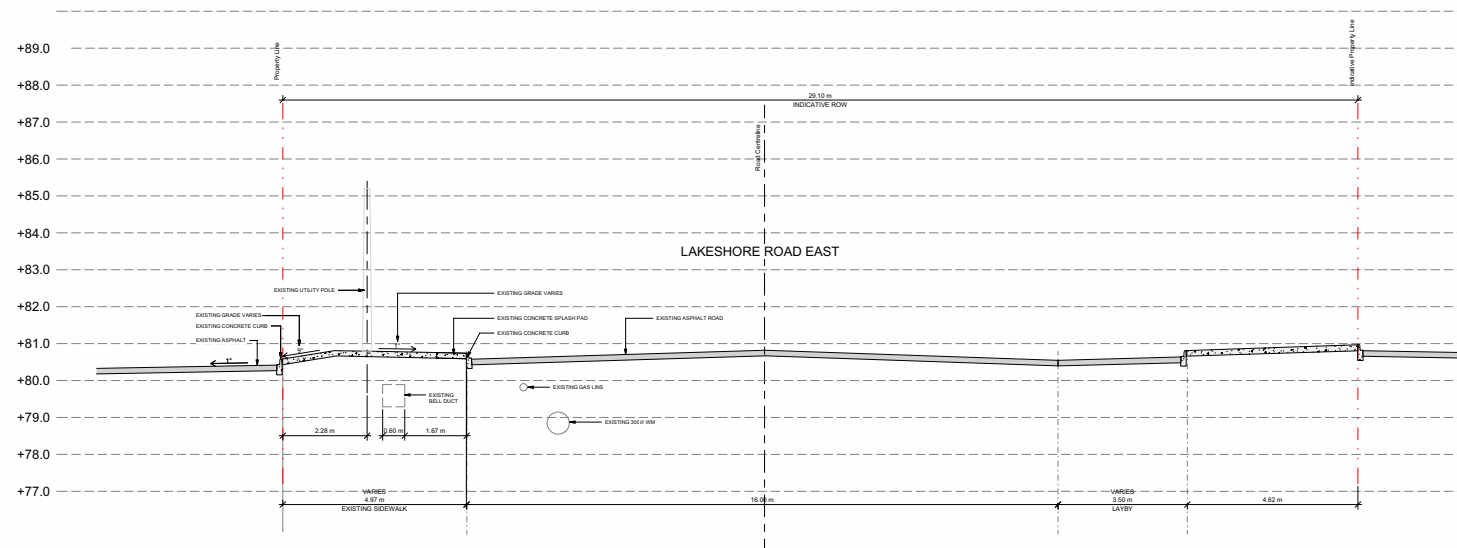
Existing Lakeshore Road East Typical Street Section (please see Appendix 1 for 1:50 sections)
